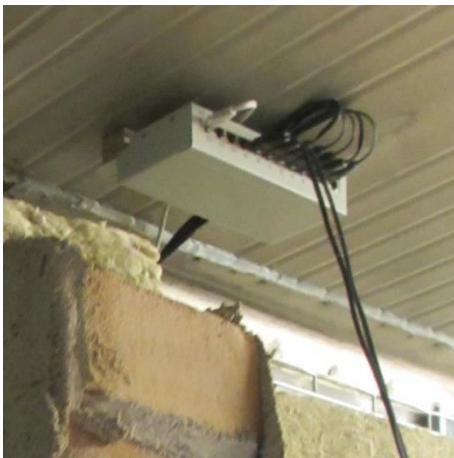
Patch panel connecting multiple sensors to 1 cable.
